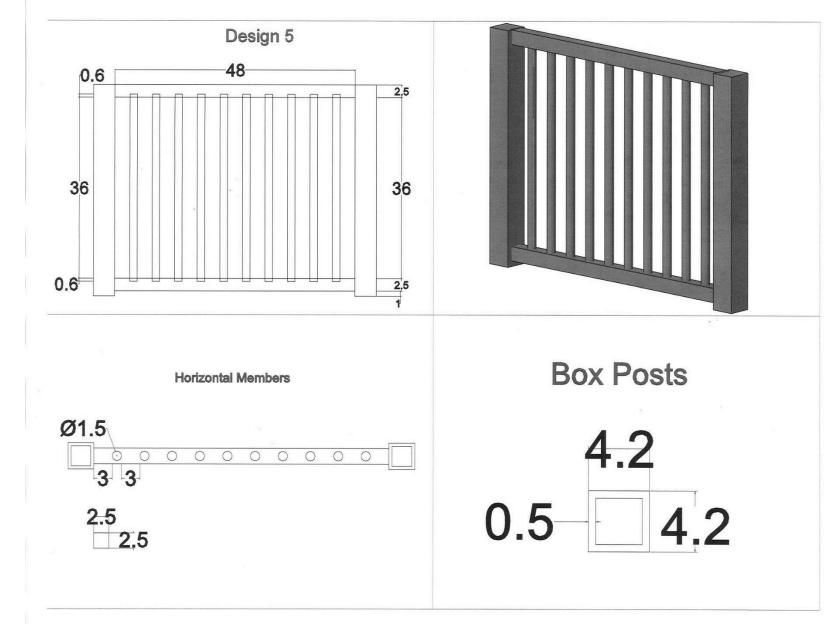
Design 5: HDPE Posts, Wood Rails, FRP Spindles
